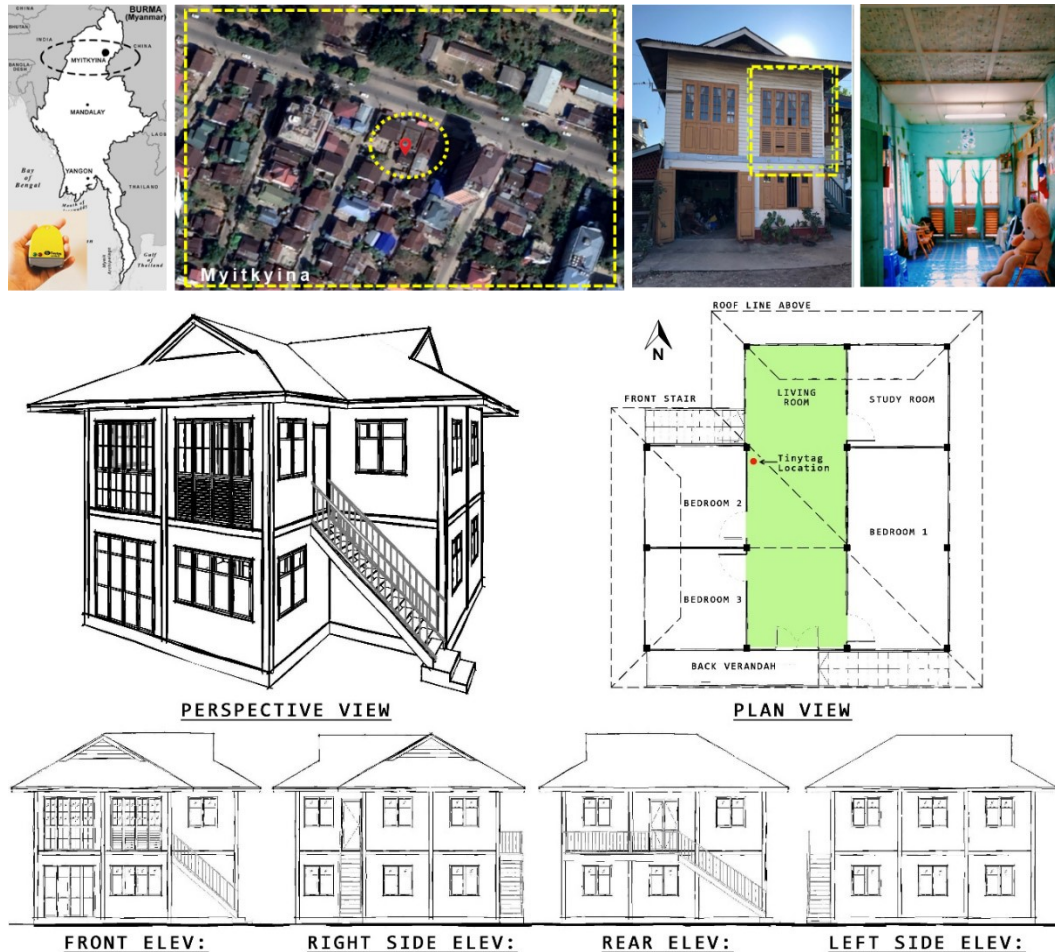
Location of the monitored dwelling in Myitkyina, instruments for measurement, location of a monitored room, and elevation views of the dwelling.
